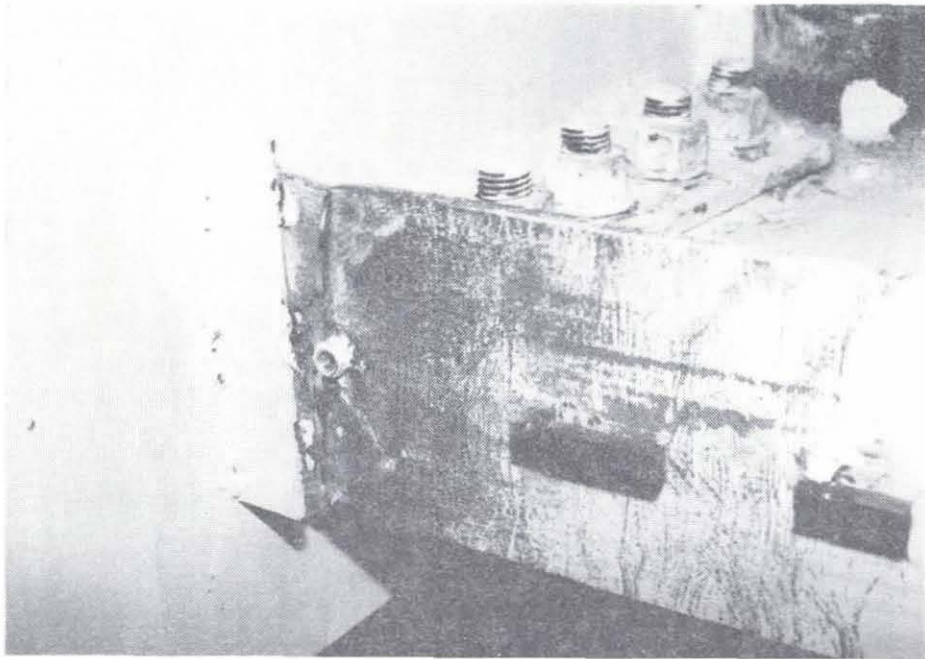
Fracture of Beam Bottom Flange (Specimen 13)
